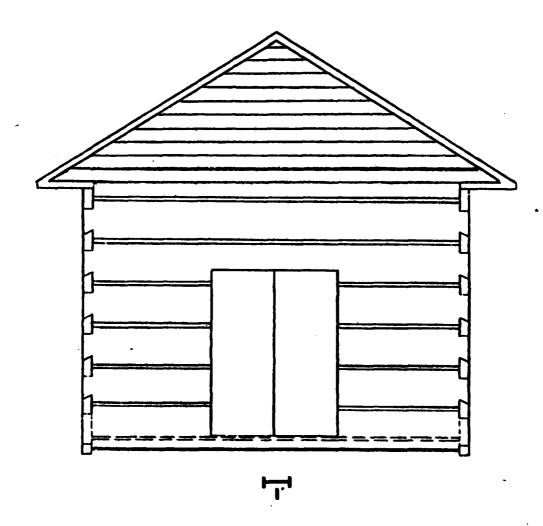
St. Michael's Roman Catholic Church. Line drawing of facade.
